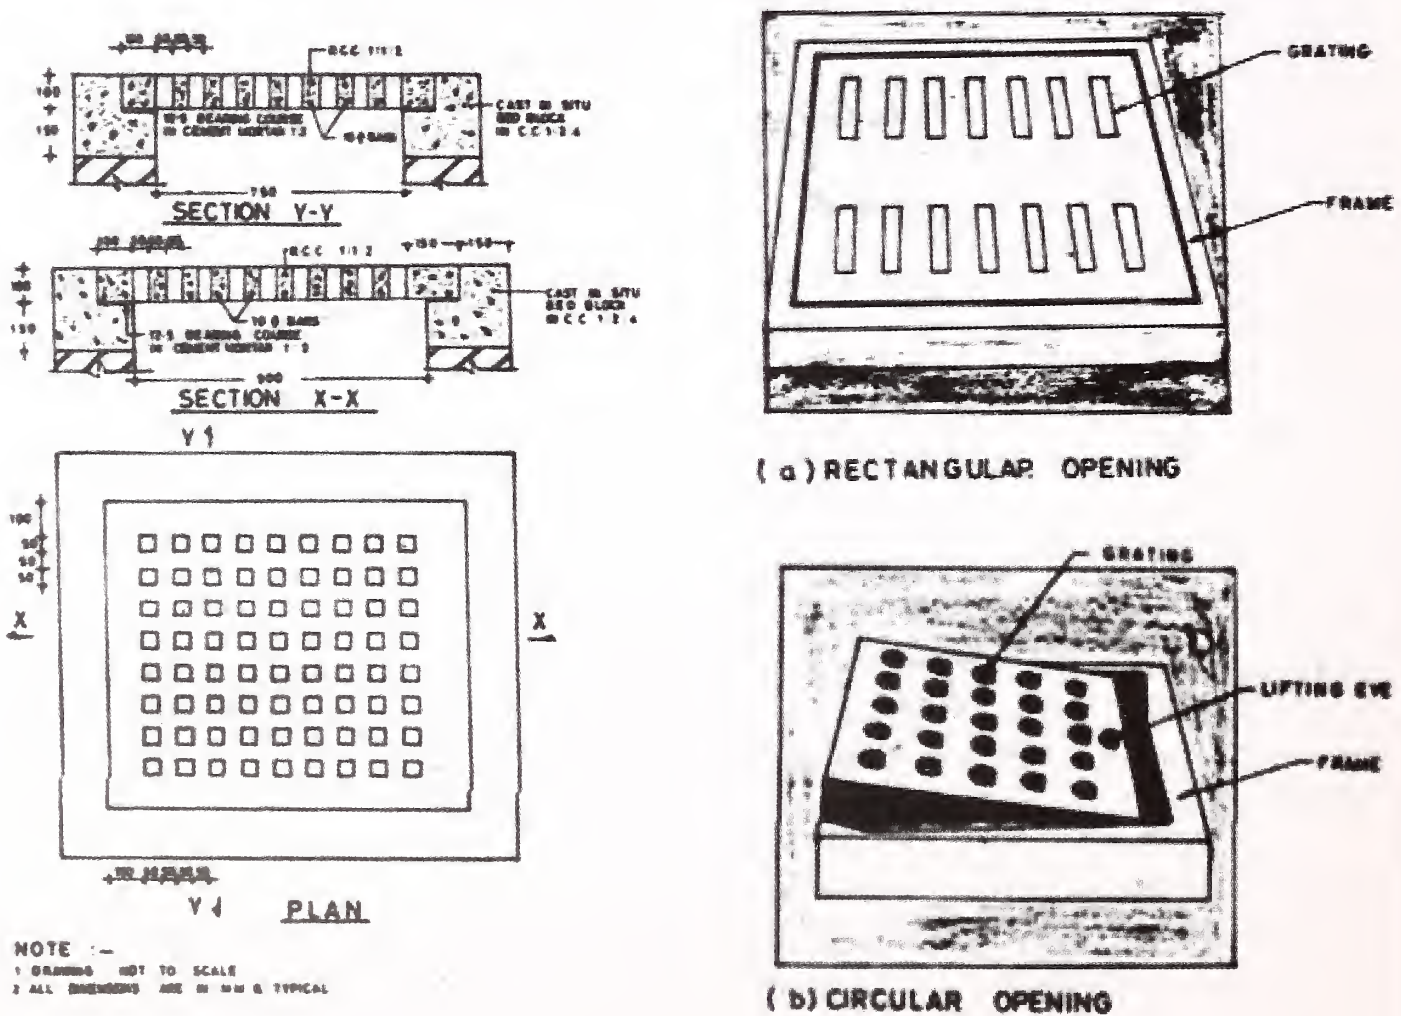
(b) Grating and Frame made of Fiber Reinforced Concrete
